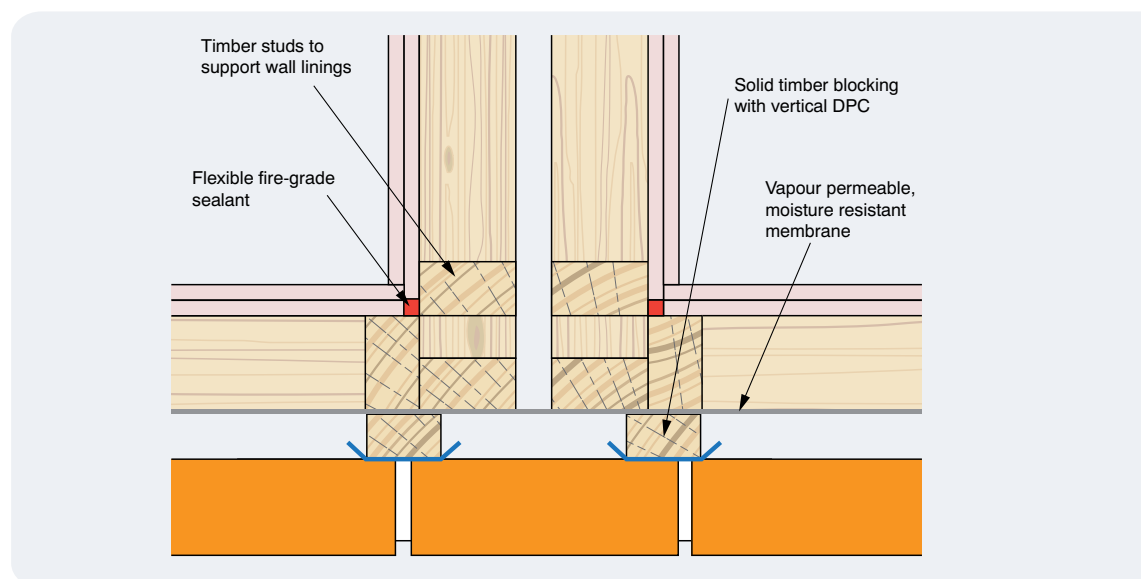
Double stud fire-protected timber internal wall intersecting a brick veneer wall with split cavity barrier system.
